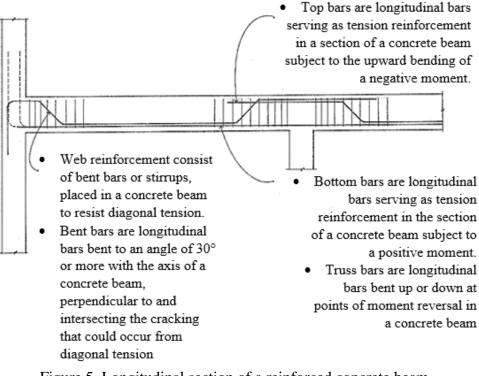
Longitudinal section of a reinforced concrete beam (Ching & Adams, 2001)
